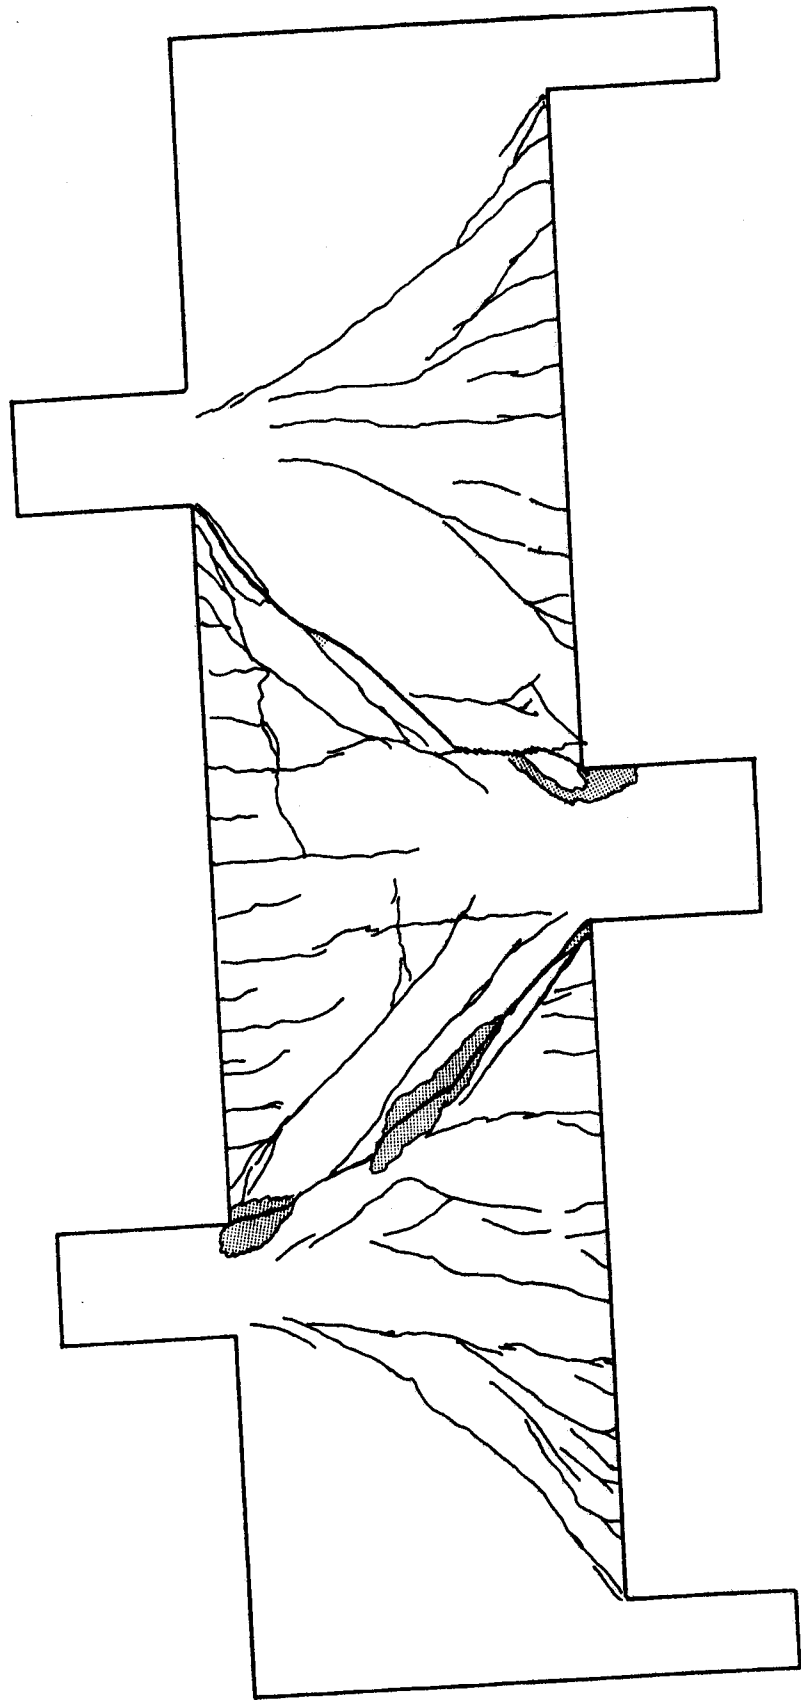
Beam 6/1.0 Crack Pattern - West Face
